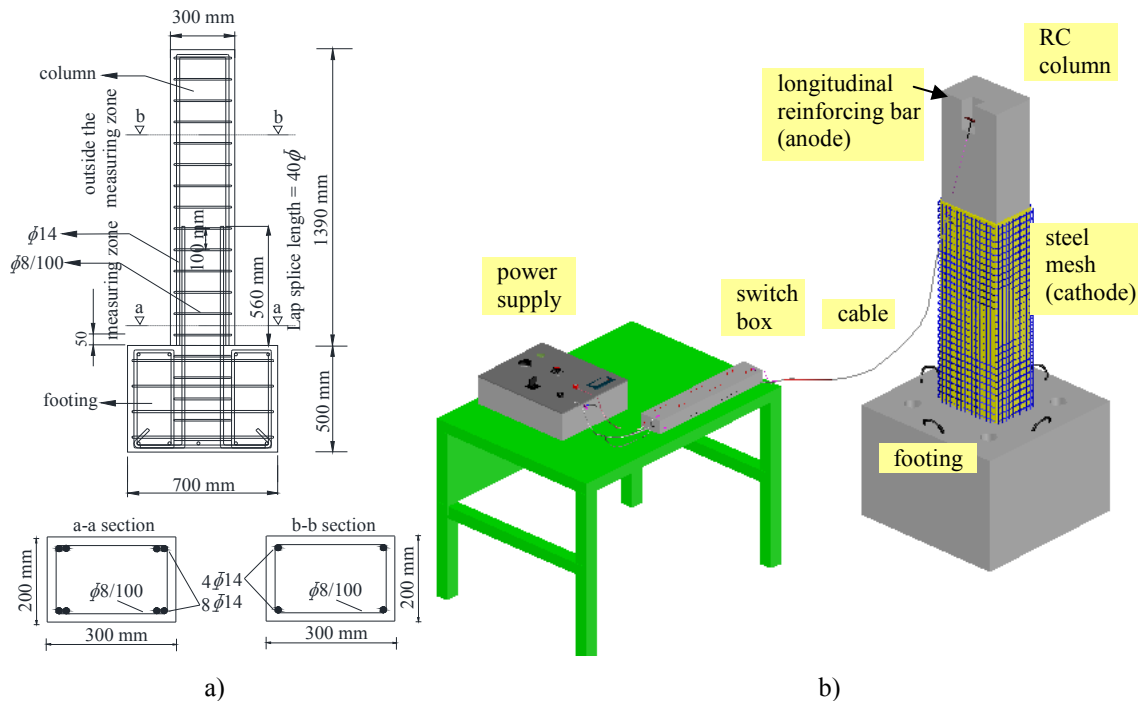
a) Reinforcement details of specimens, b) Accelerated corrosion setup
